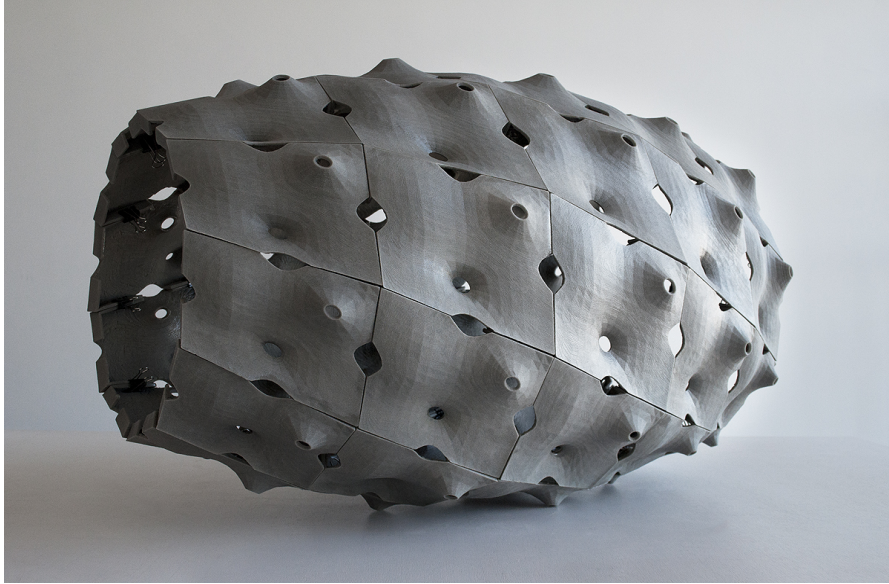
Two-foot-long cantilevered and sand-blasted cylindrical beam
